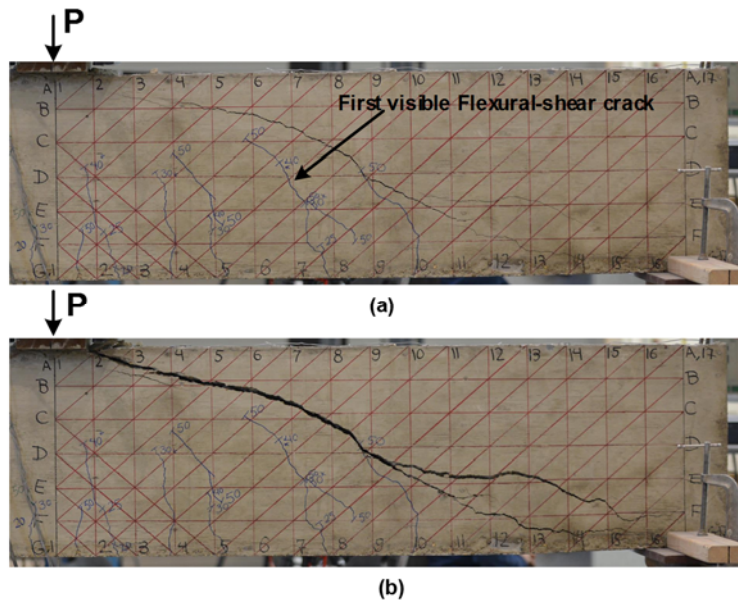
Cracking pattern for beam RC18a at: (a) right after peak load; (b) failure
